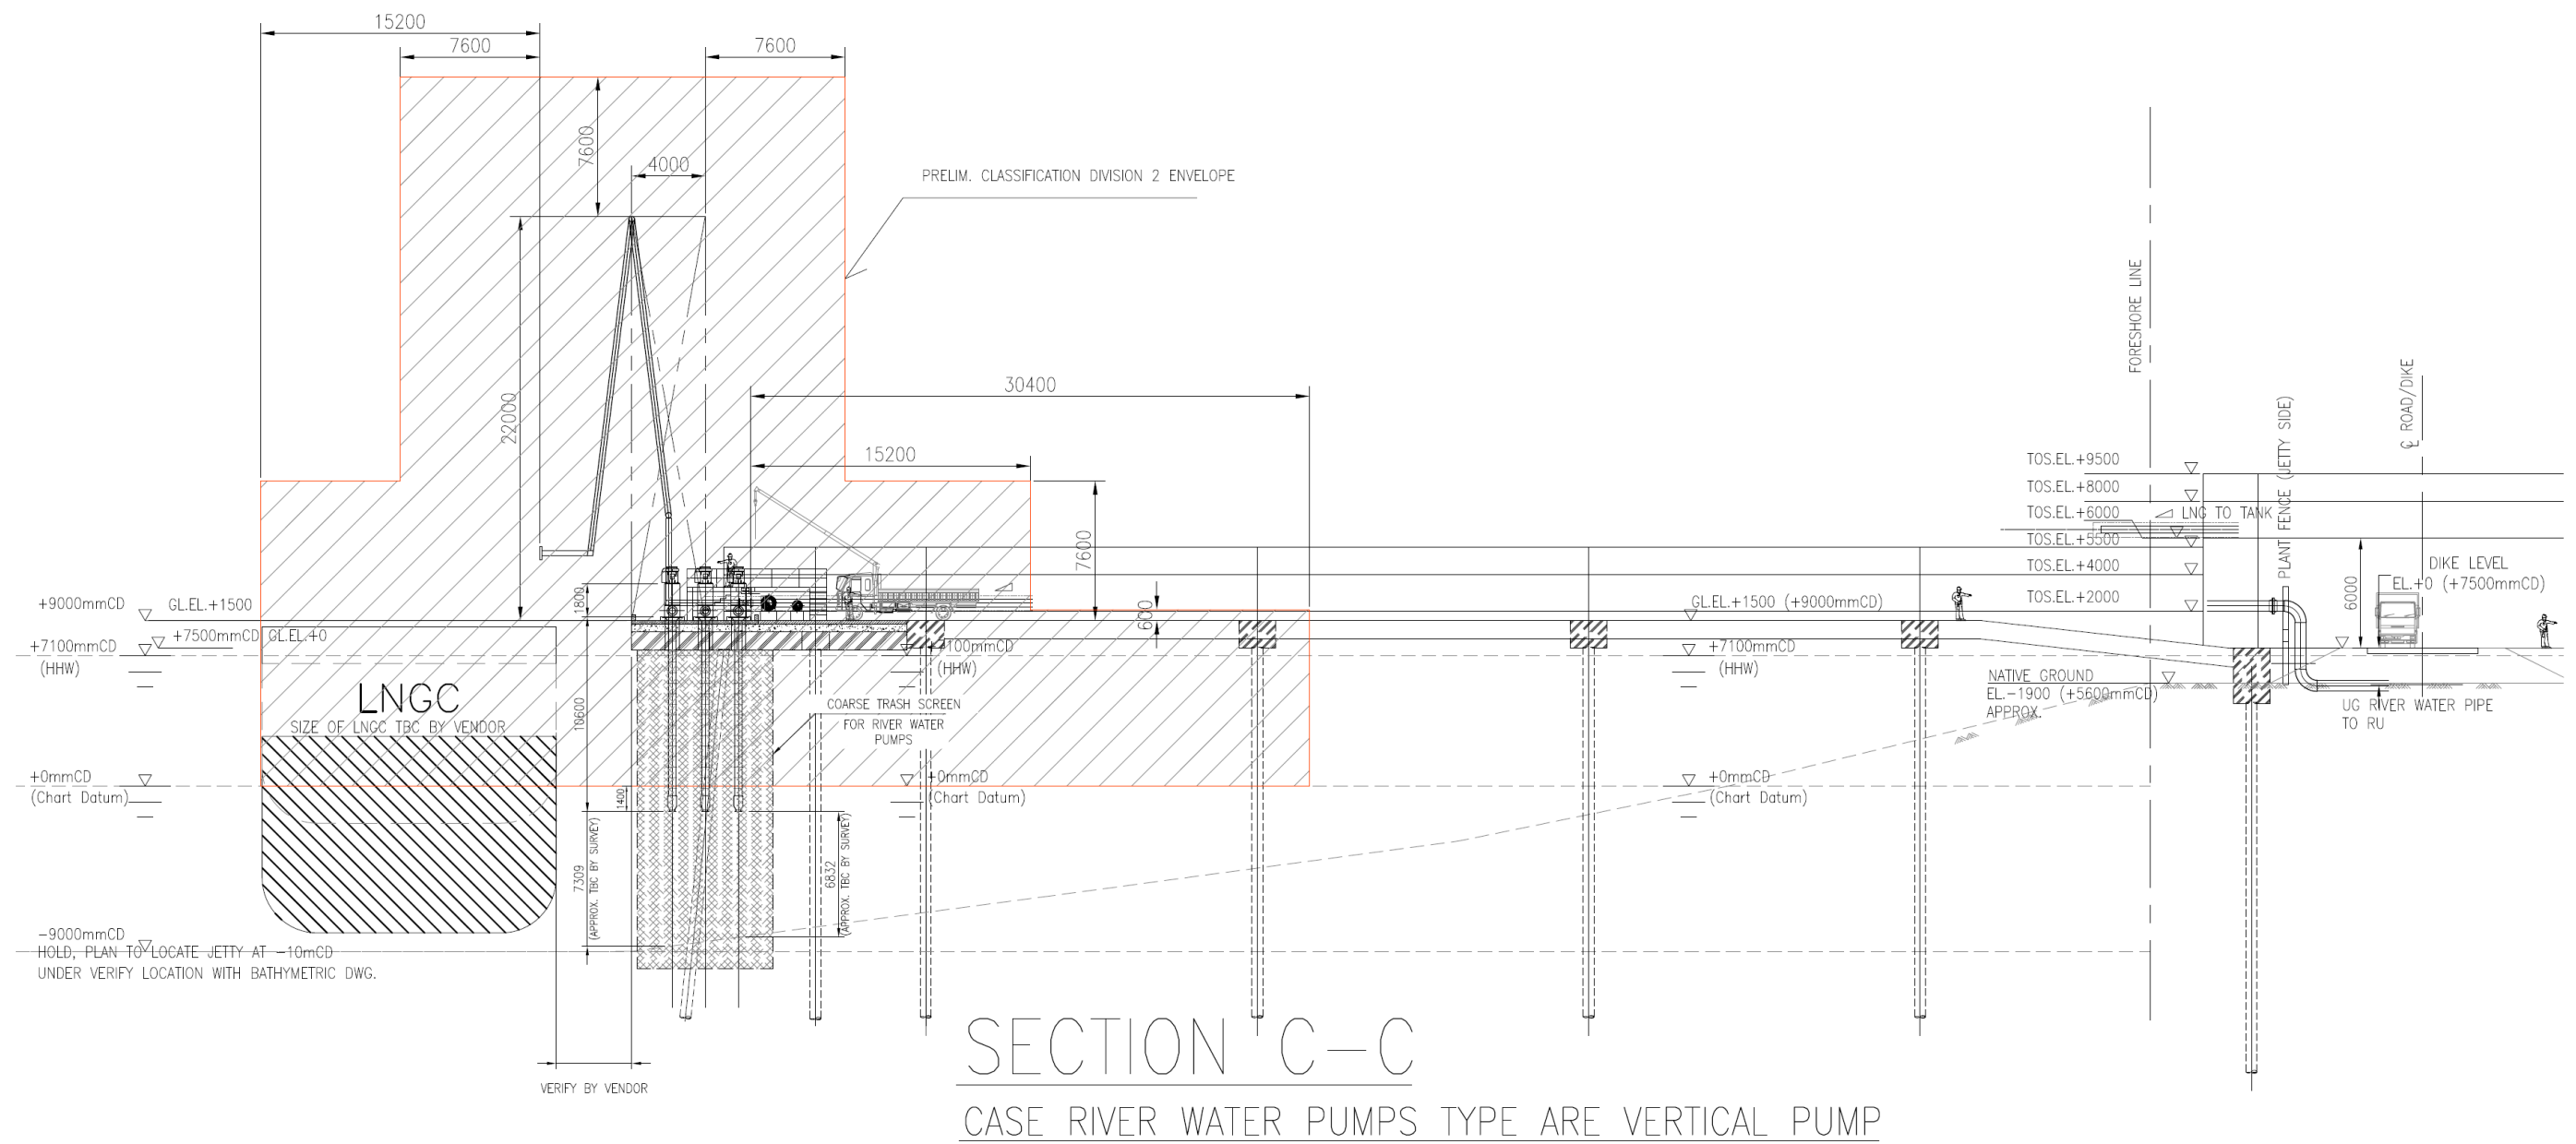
Technical Drawing of Unloading Jetty (Section view)
